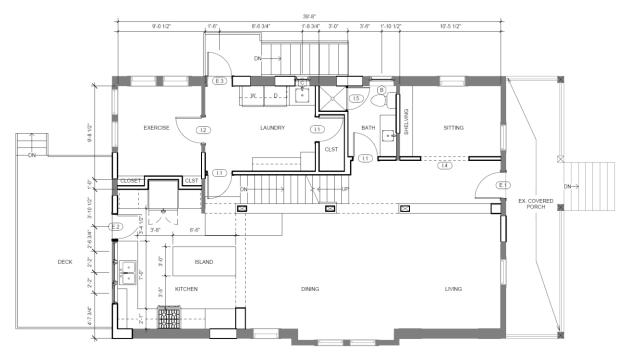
The approved 1st-floor plan from the 8/17/2022 HAWP.
